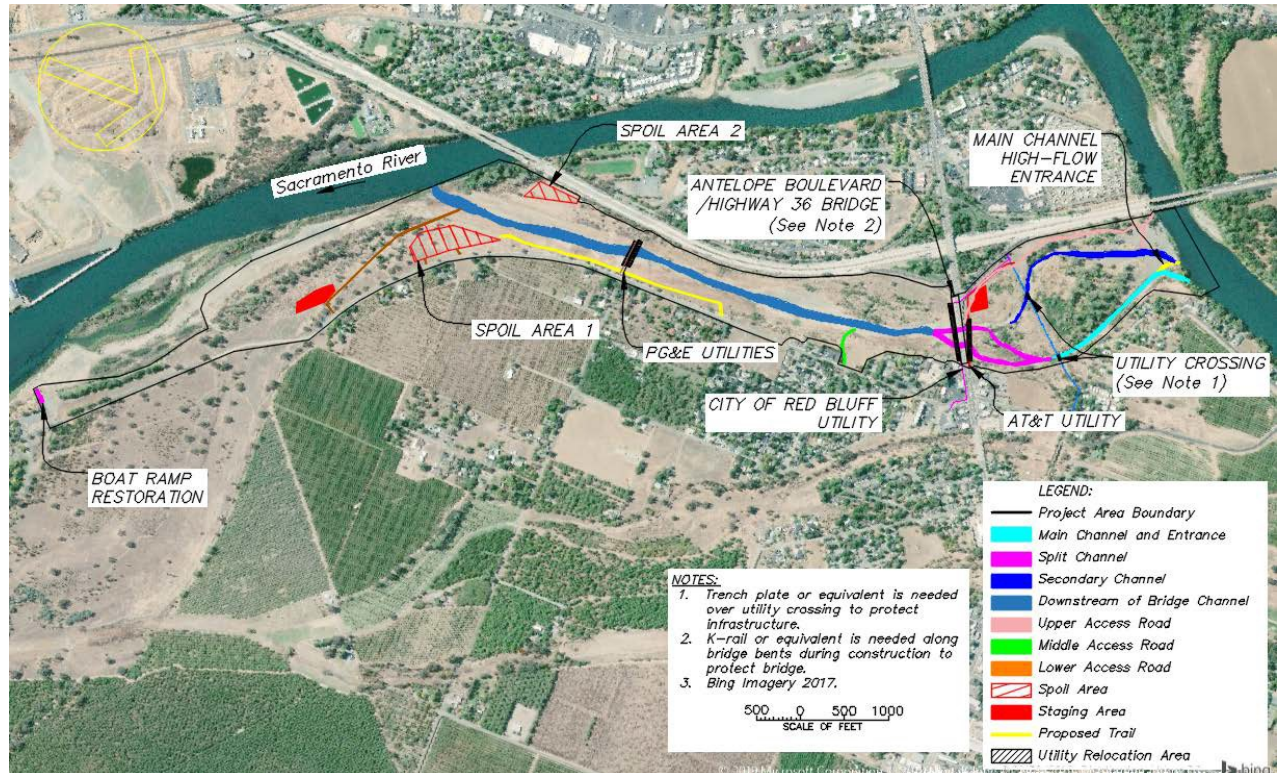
Proposed East Sand Slough Side Channel Project Construction and Access Areas
